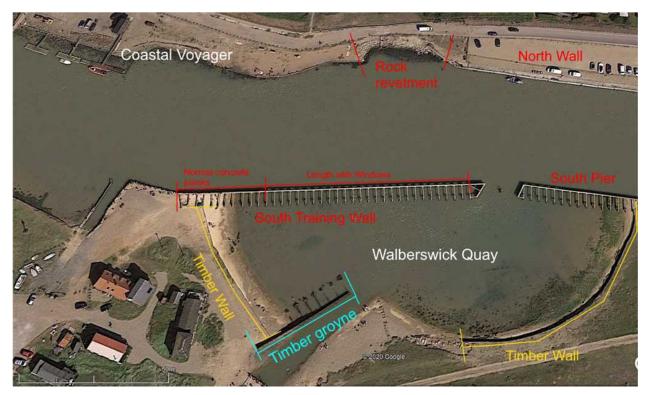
Map of South Training Wall, Walberswick Quay with marked lengths where windows have been cut in concrete planks
